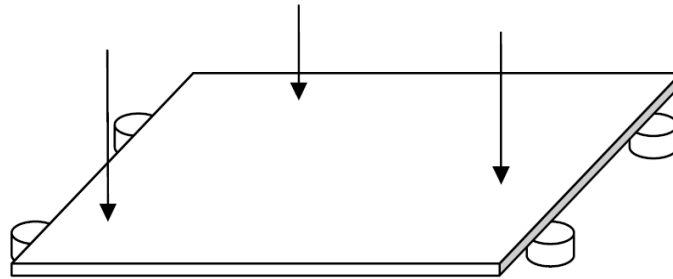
Loading perpendicular to the solid wood slab element – element of dowel jointed timber boards – Schematic
